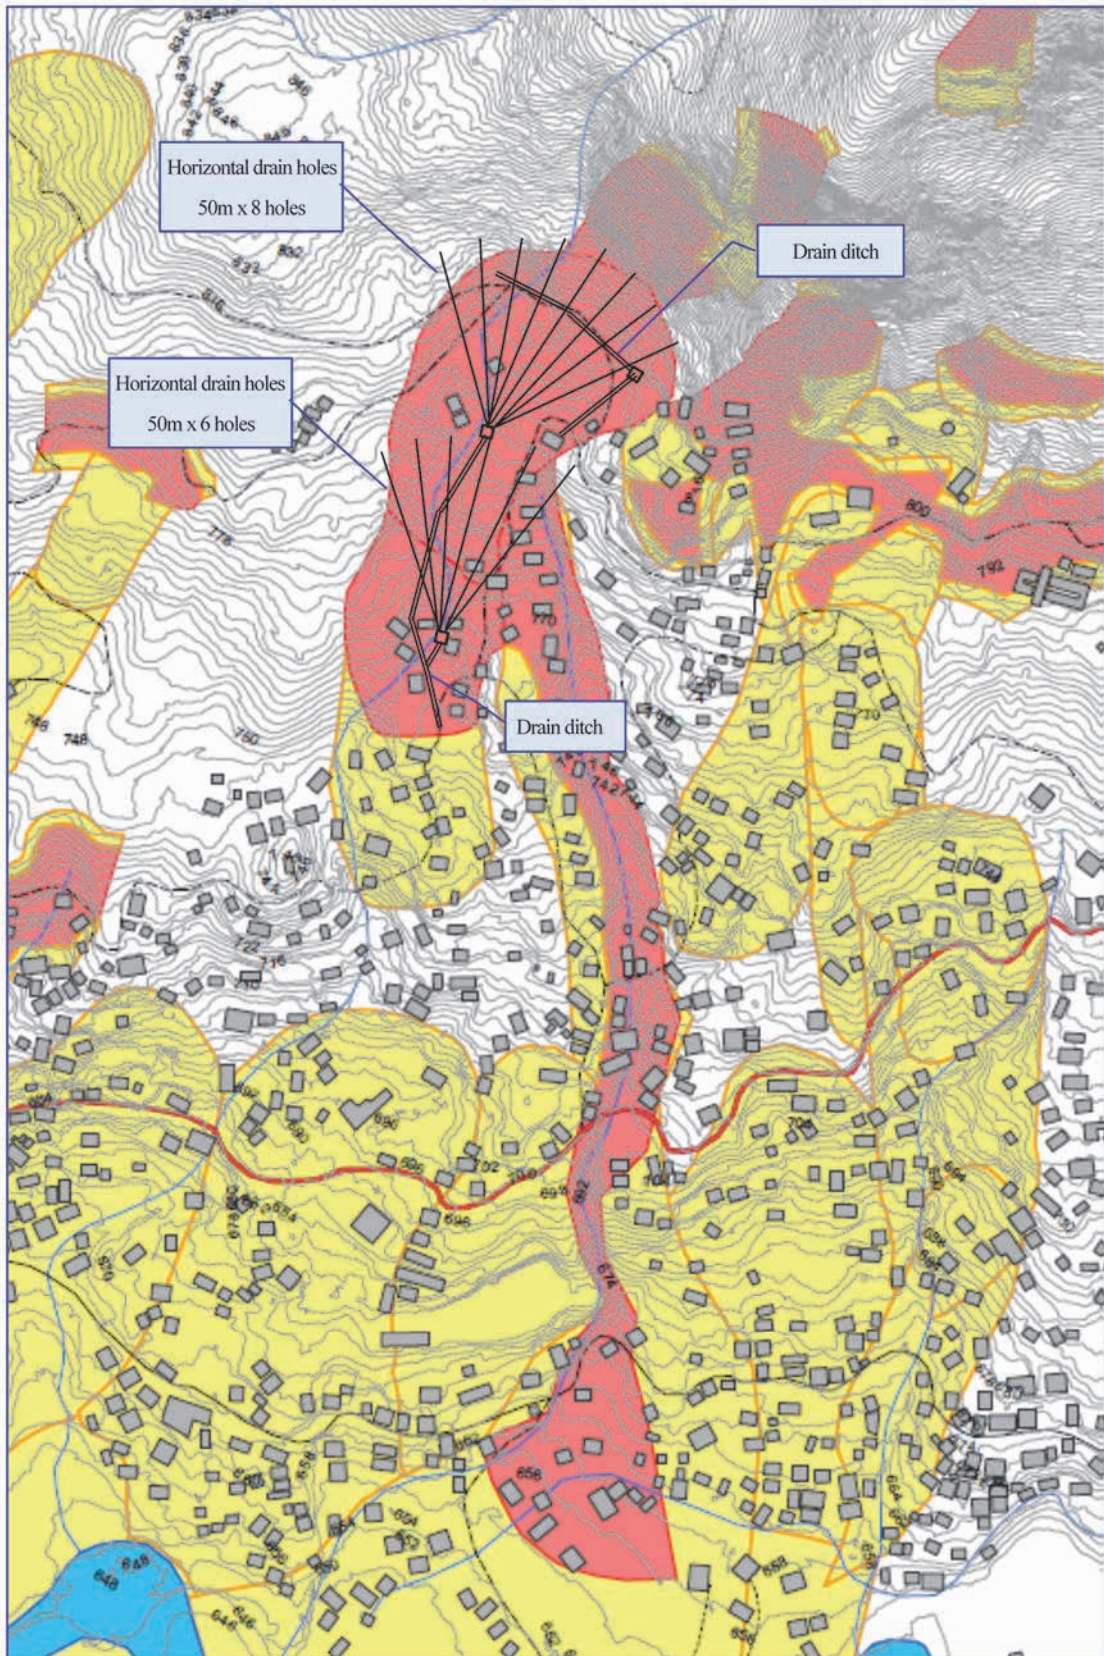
Layout of the Planned Structural Measures for Site 3 in the Weeriyapura Pilot Site
